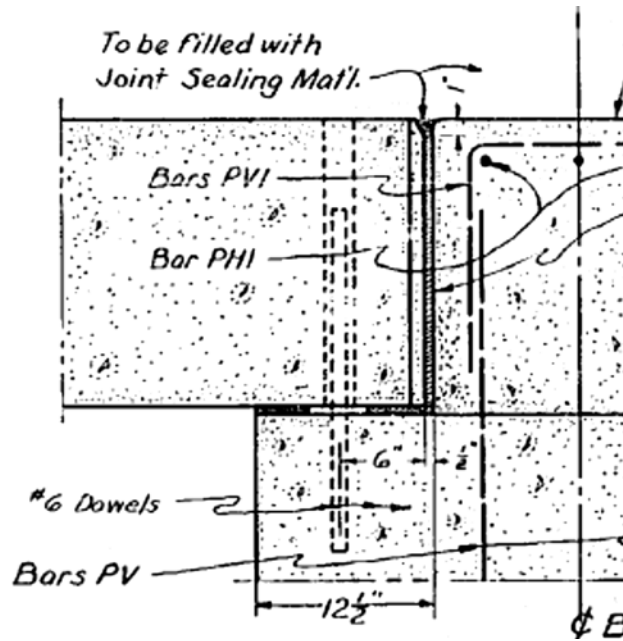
Anchorage Details Connecting Voided Slabs to Substructure of Adkins Road Bridge
